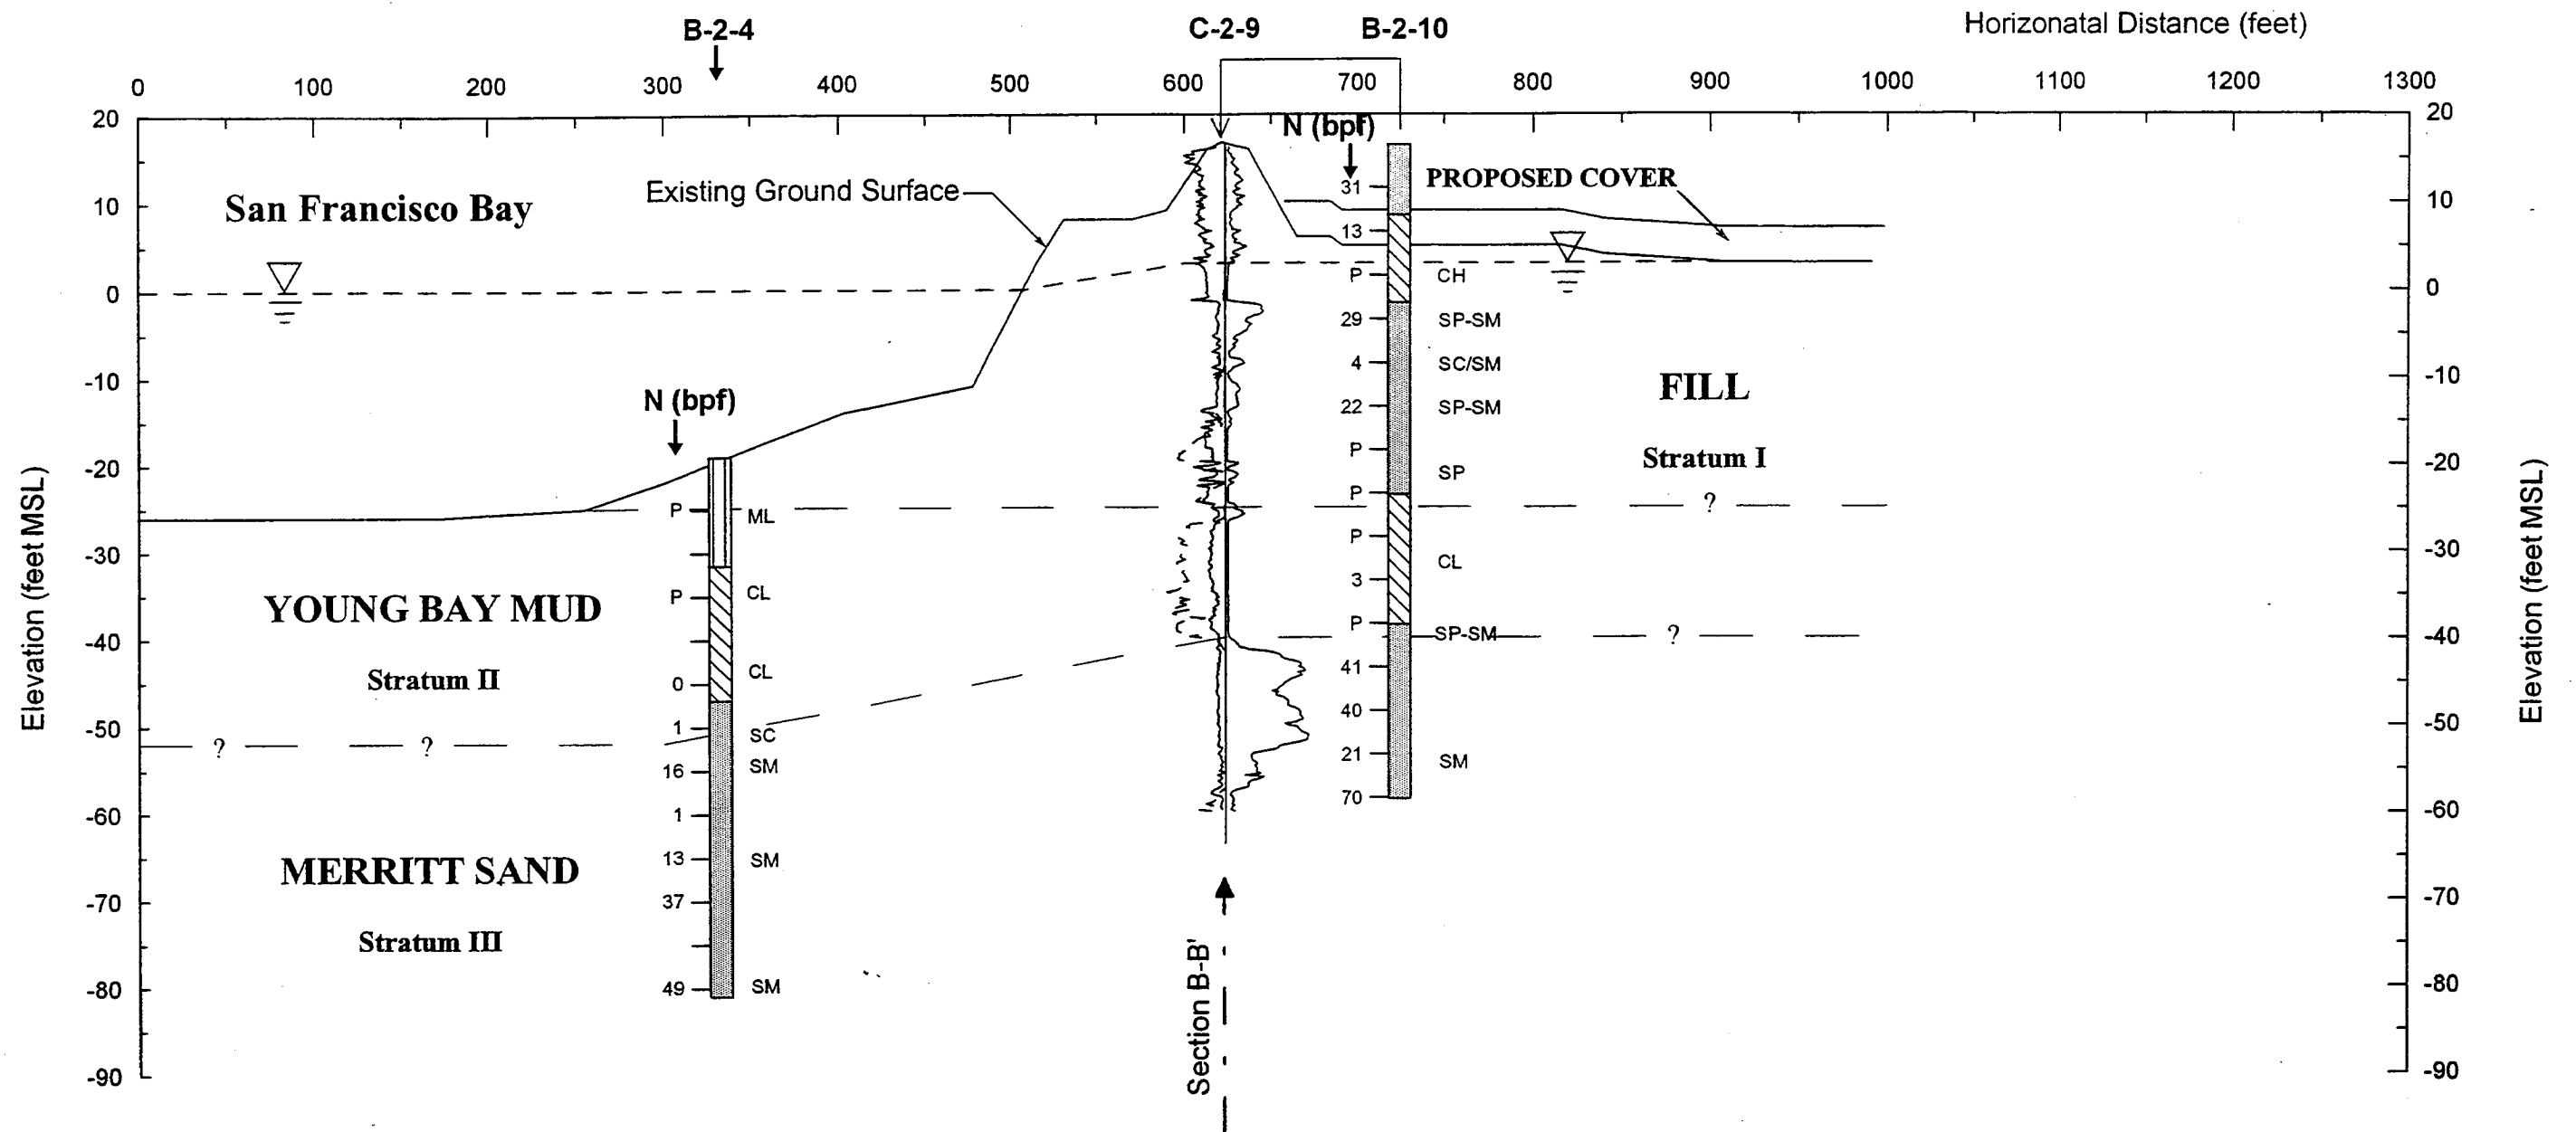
INTERPRETED SUBSURFACE SOIL PROFILE SECTION D-D' (LOOKING NORTH)
